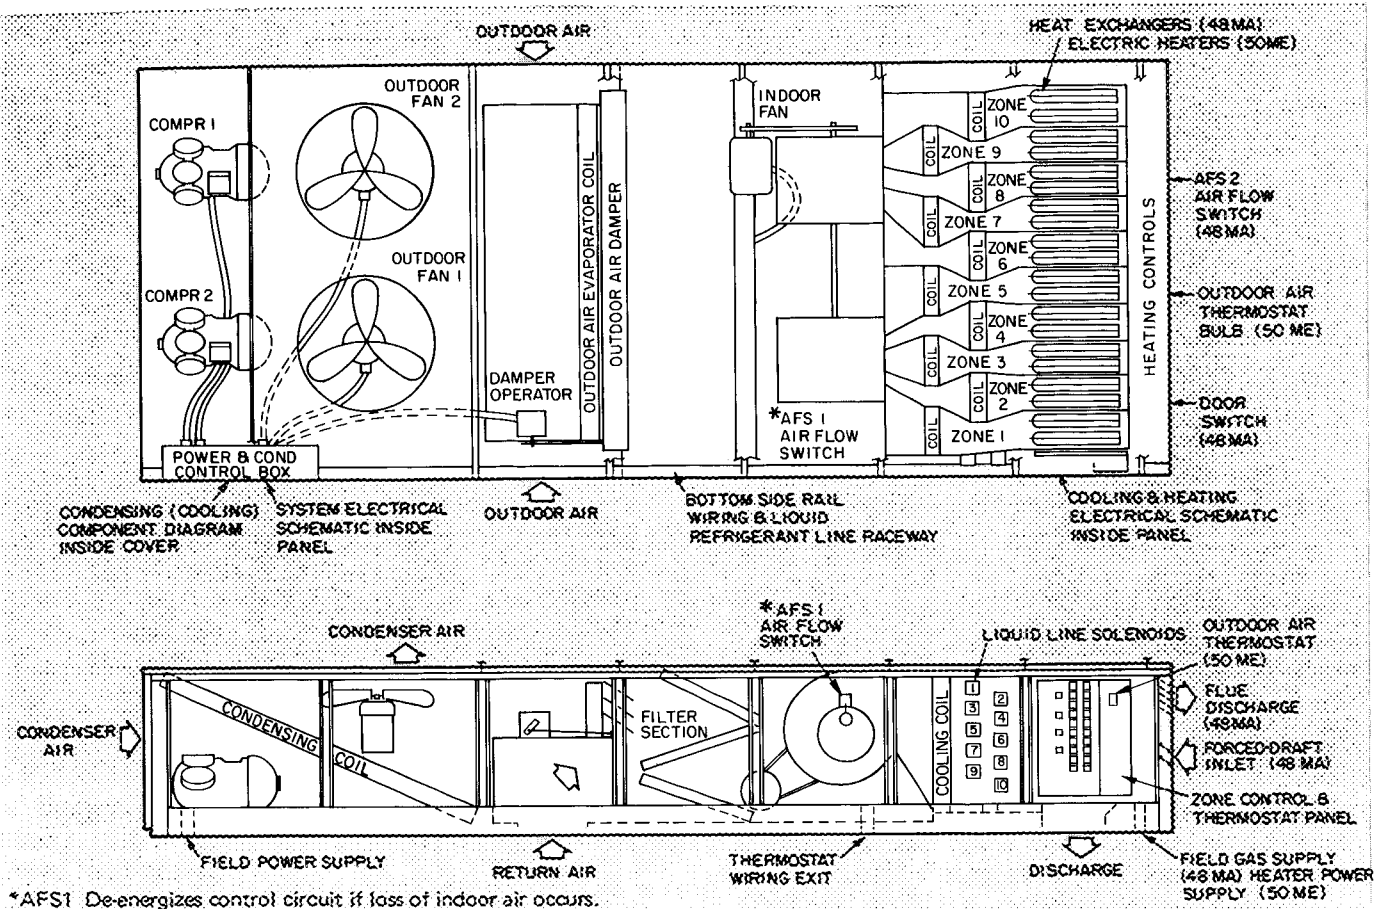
Major Component Identification (Ten-Zone Unit Shown, Eight-Zone Units Similar)
